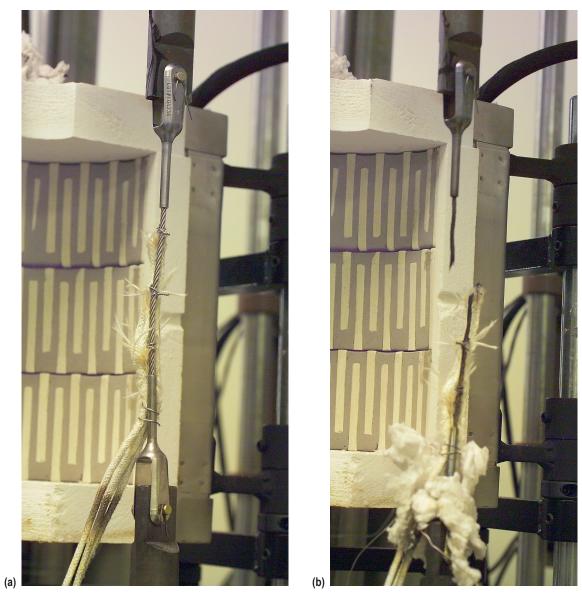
104236–ELV–7 (a) before testing and (b) after testing.
